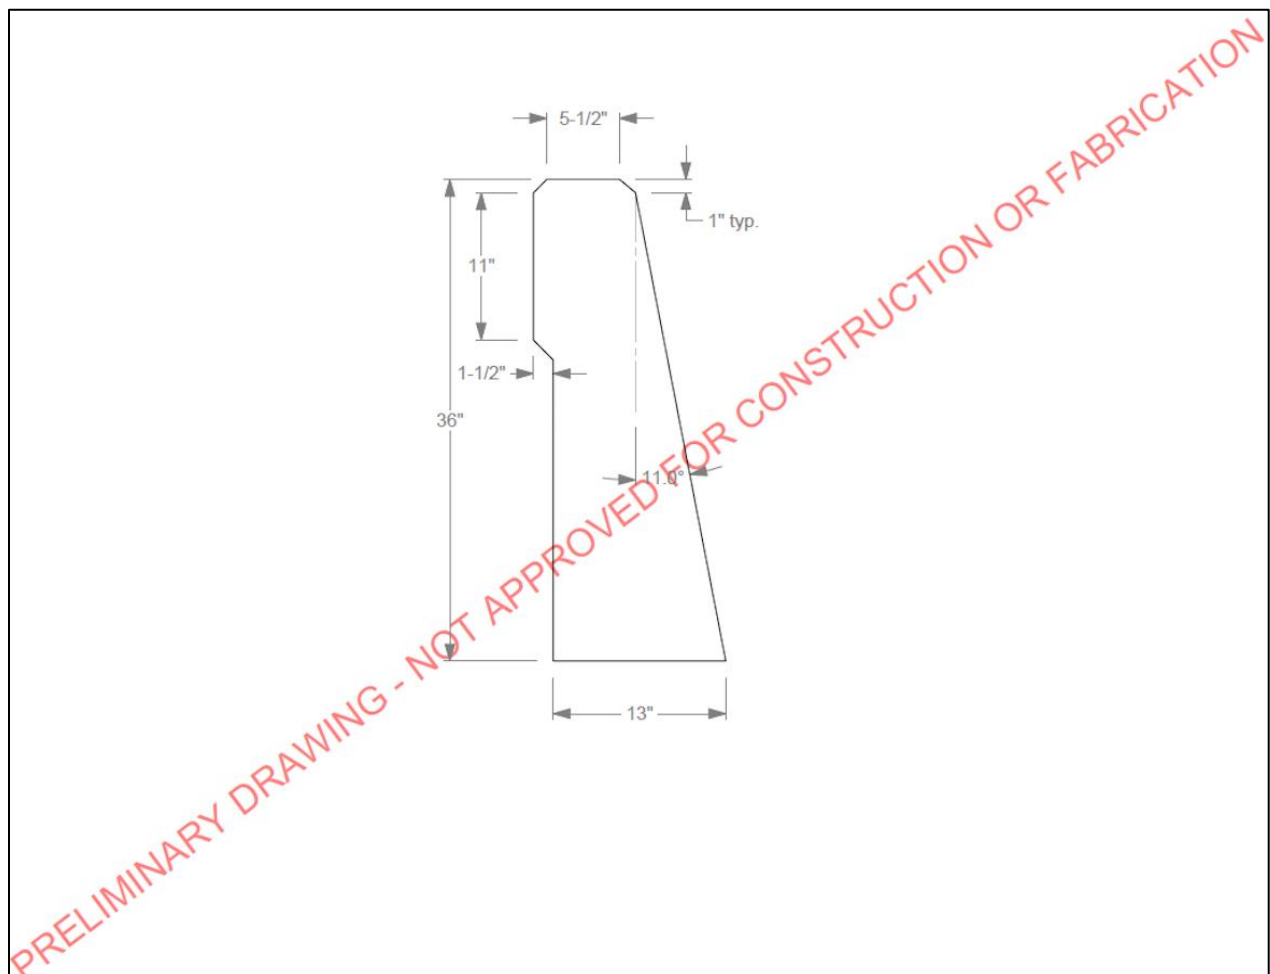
36-inch Tall Single Slope Barrier Profile (TTI, 2017)
